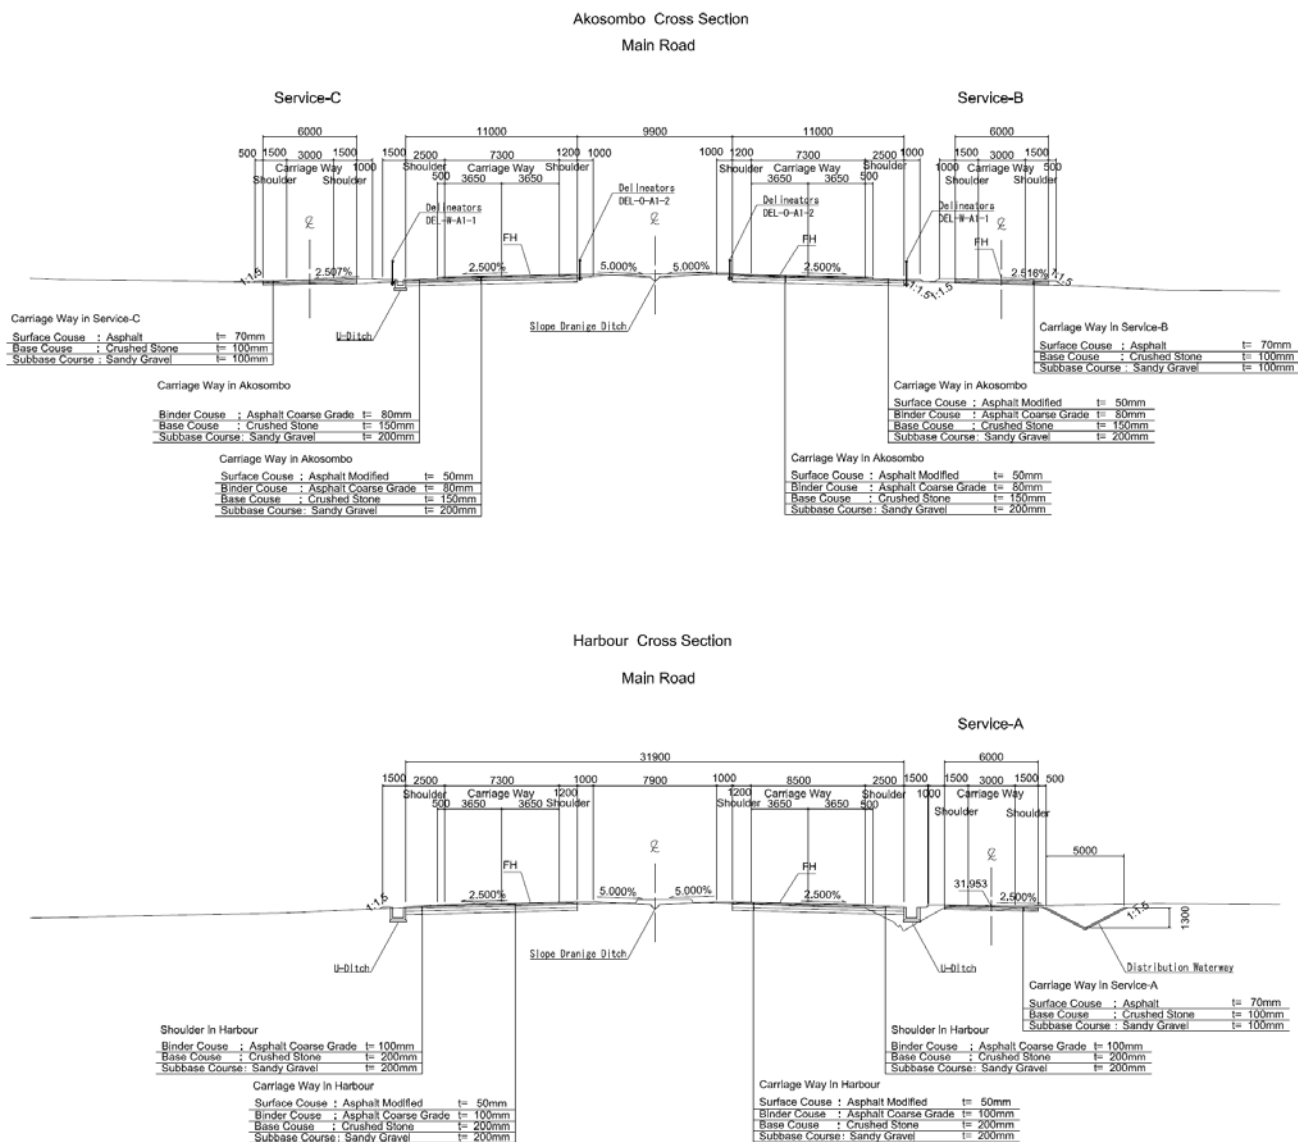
Harbour Road - Akosombo Road: Typical Cross Section
